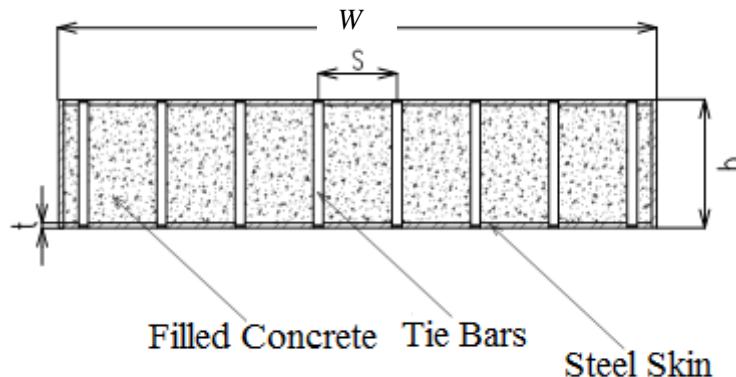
Proposed Rectangular CFSSP-Wall Cross-section Configuration
